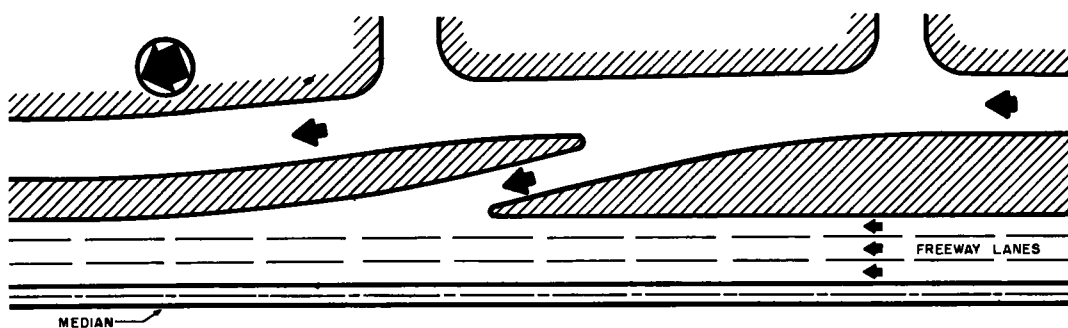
Ramp study section, Dallas Central Expressway (North)—Study I.
